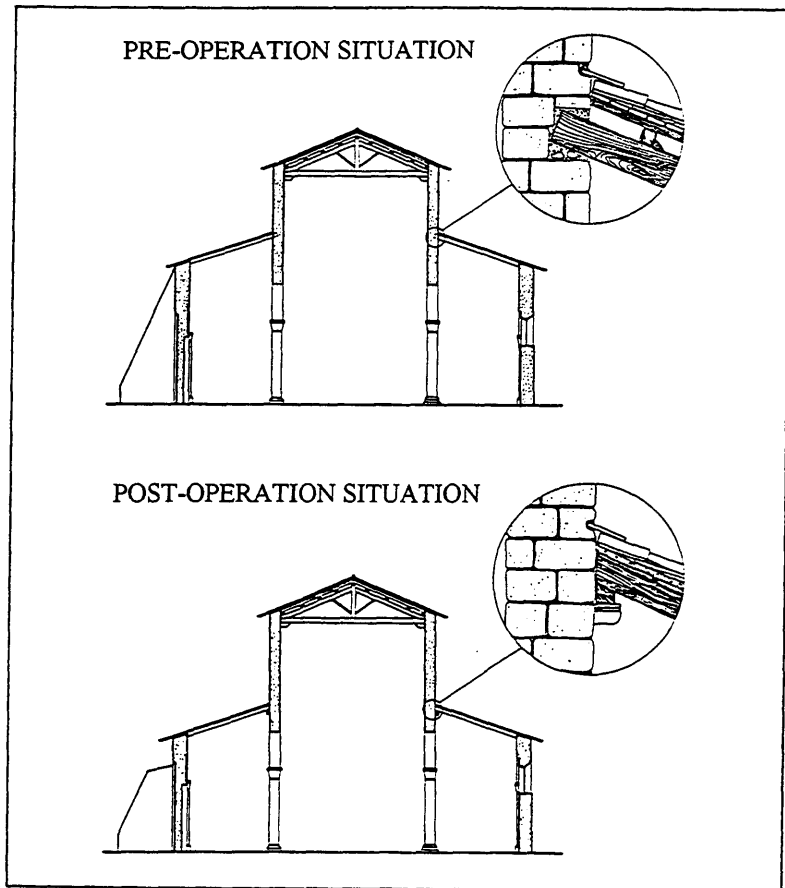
Church of S. M. Maggiore, modification to the joint between the roof beams and the nave walls in 1954 restoration.
